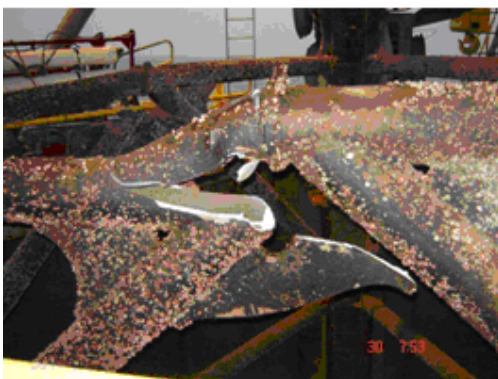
When attempts were made to jack the rig down, extreme loads were imparted to the legs at the transition to the hull/leg guides using further leg cracks.
